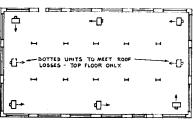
Typical installation of horizontal air discharge unit heaters on factory floor providing rotary air motion around walls.
